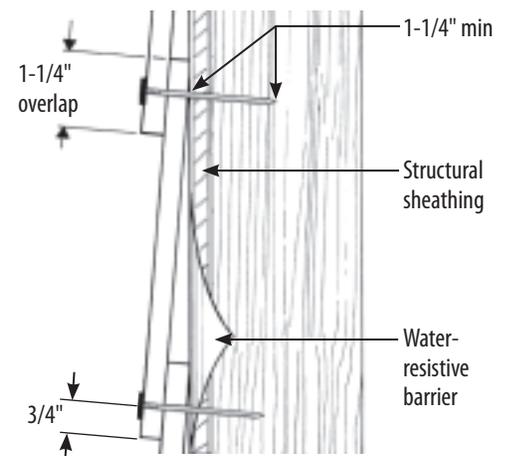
IMPROPER FACE FASTENING NAIL POSITION
